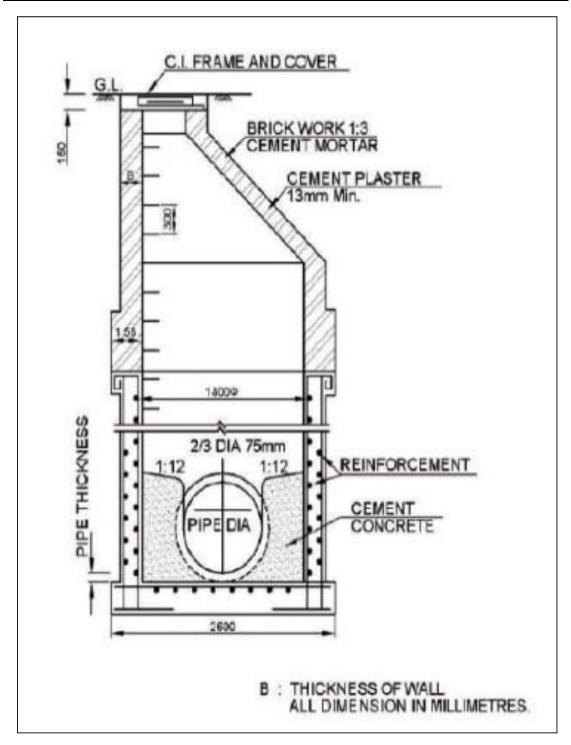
Typical Cross Section of proposed RCC and Brickwork Combination Manhole Source: Process and Hydraulic Design Report – TP - IV
